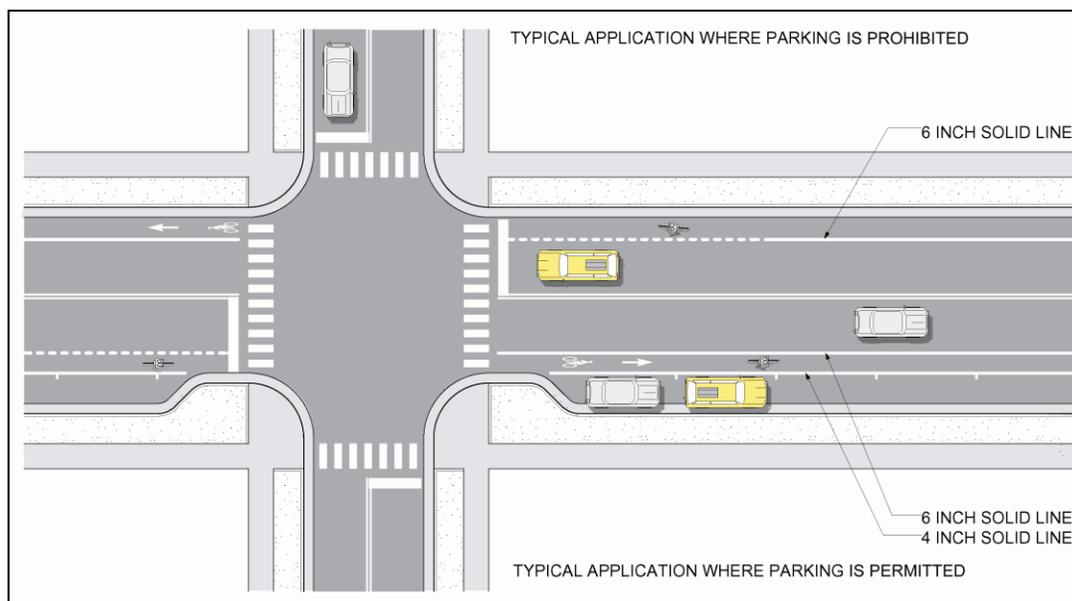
This figure shows bike lanes on a street with and without on-street parking. Note that the curb extensions do not extend into the bike lanes on the side with on-street parking.
